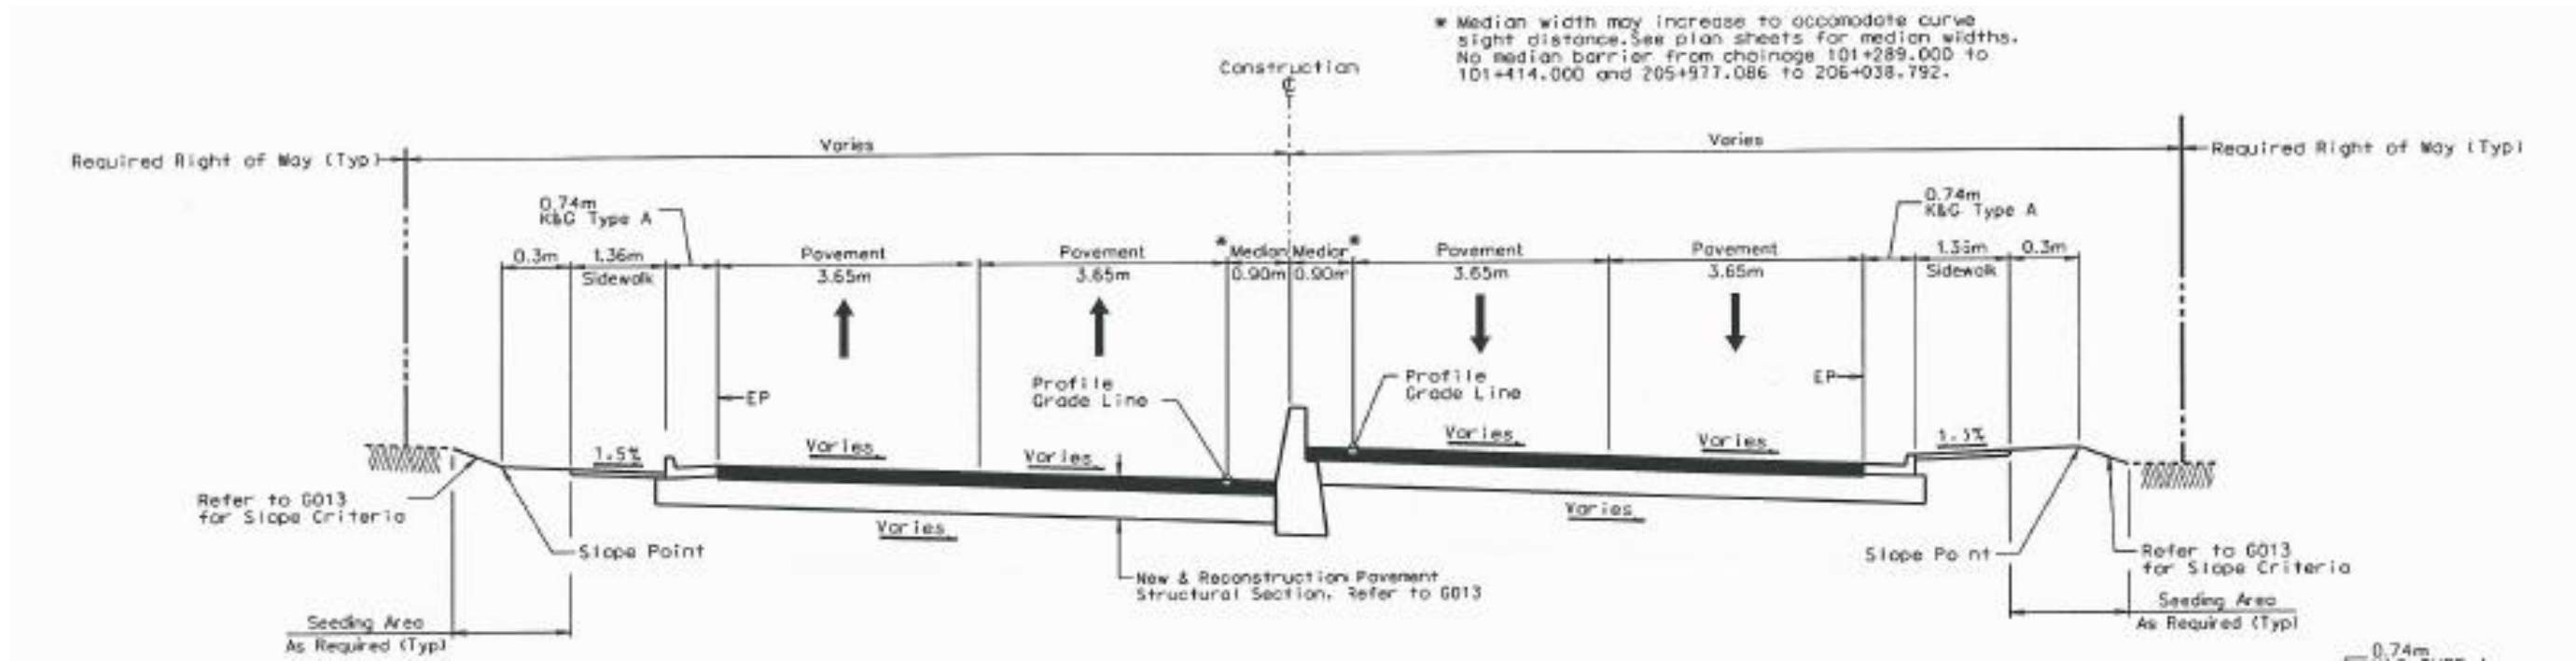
Typical road section along chainage 101+289 to 106+877 and 115+436 to 115+705, with design speed 65 km/h
